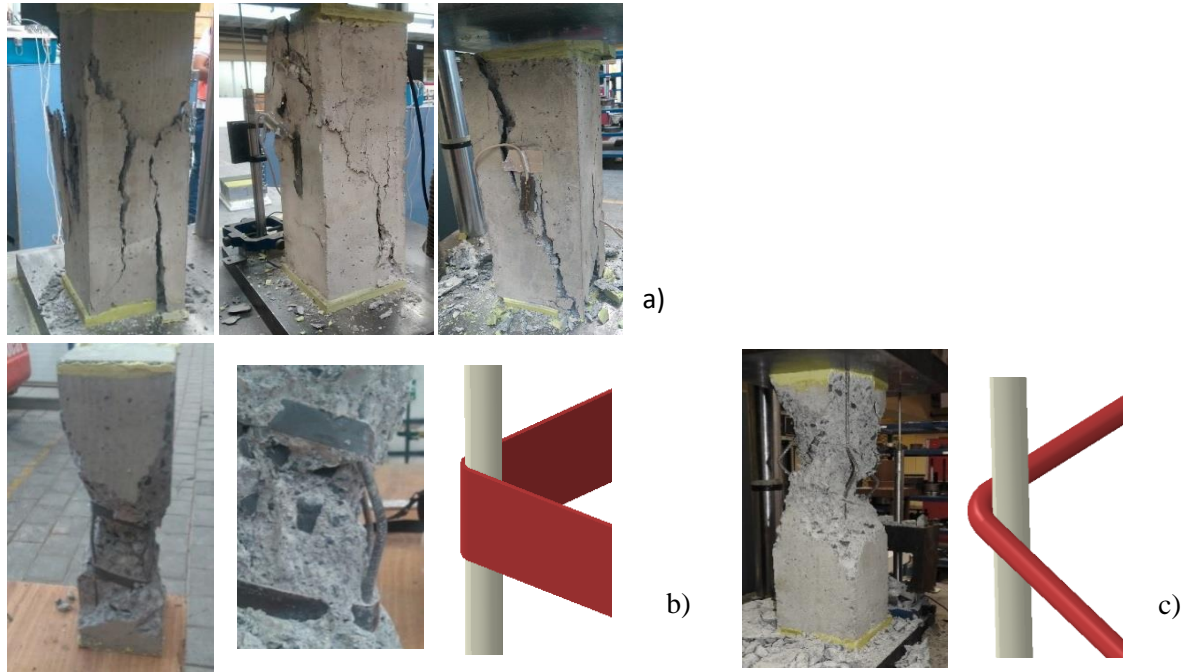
a) Modes of failure in the tested specimens: b) Tested specimens with strapping section, zoom in and schematic detail, c) Tested specimen with circular cross section and schematic detail.
